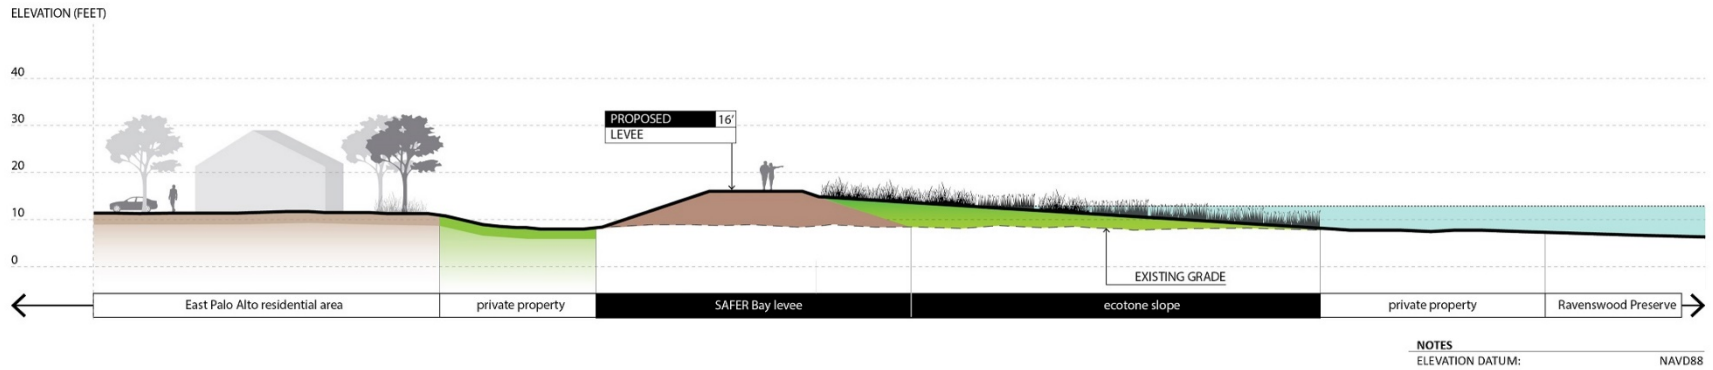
CROSS-SECTION OF THE SAFER BAY LEVEE ALONG THE EAST PALO ALTO SHORELINE FOR ALTERNATIVE 2 – PROTECT IN PLACE
